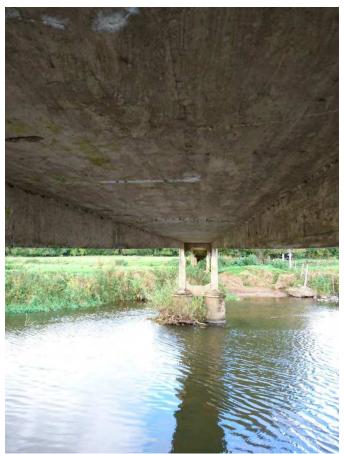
Span 3- D/S Edge Beam- Item 1.
